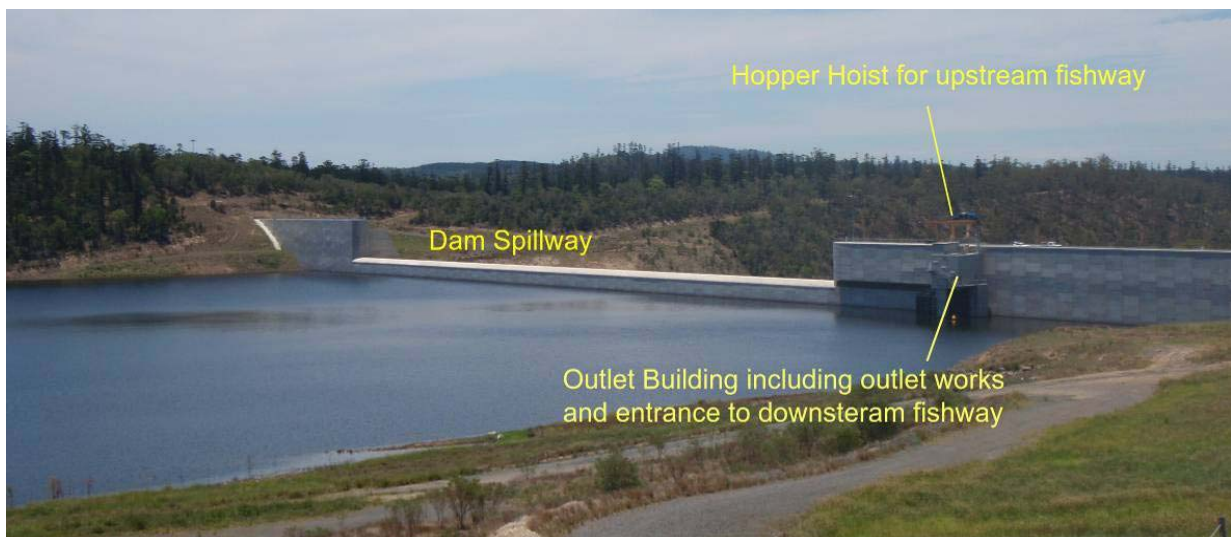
Paradise Dam wall viewed from downstream (A Mackay, August 2006)
